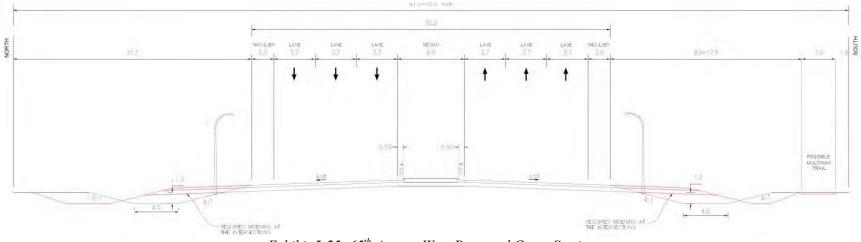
65th Avenue West Proposed Cross-Section
